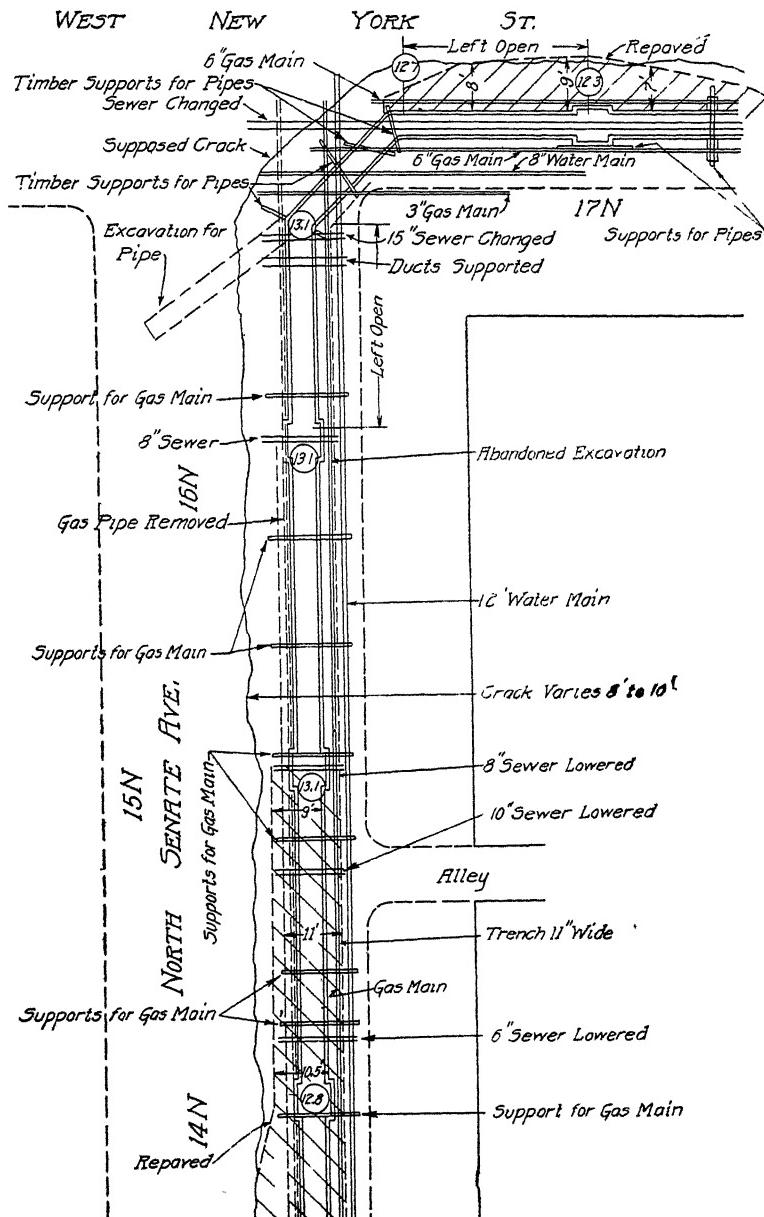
Details of Reinforced Concrete Conduit Shown in Fig. 11. Enlarged View Shown to Indicate Complications of Water and Gas Mains and Crossings.
